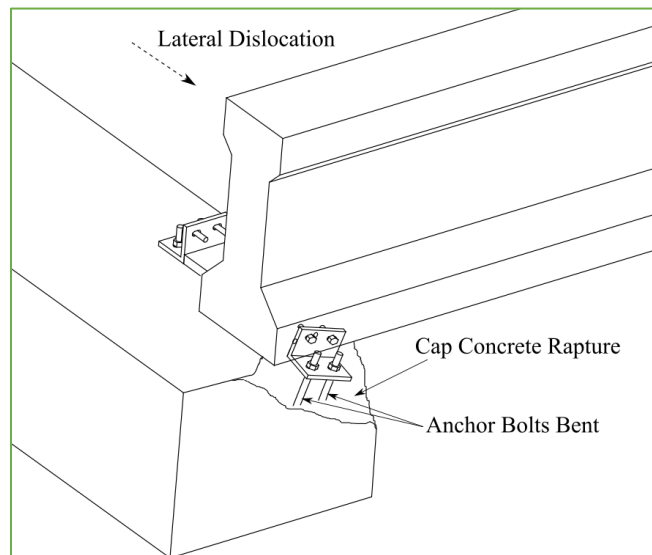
Spall and bent anchor bolts and concrete rupture at the end of bent cap
